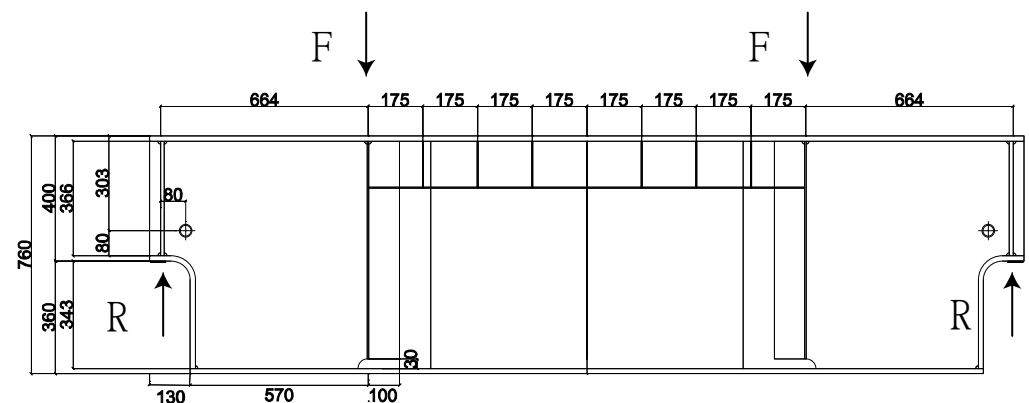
Dimensions of the variable-section support specimens with R-plates and three-web plates.
